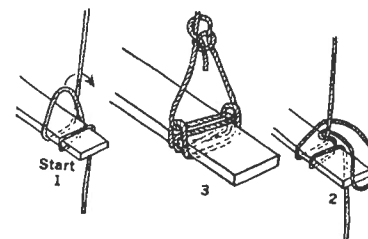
Scaffold hitch. For suspending a scaffold plank. Will prevent plank from tilting. Can also be used on plank on edge.
